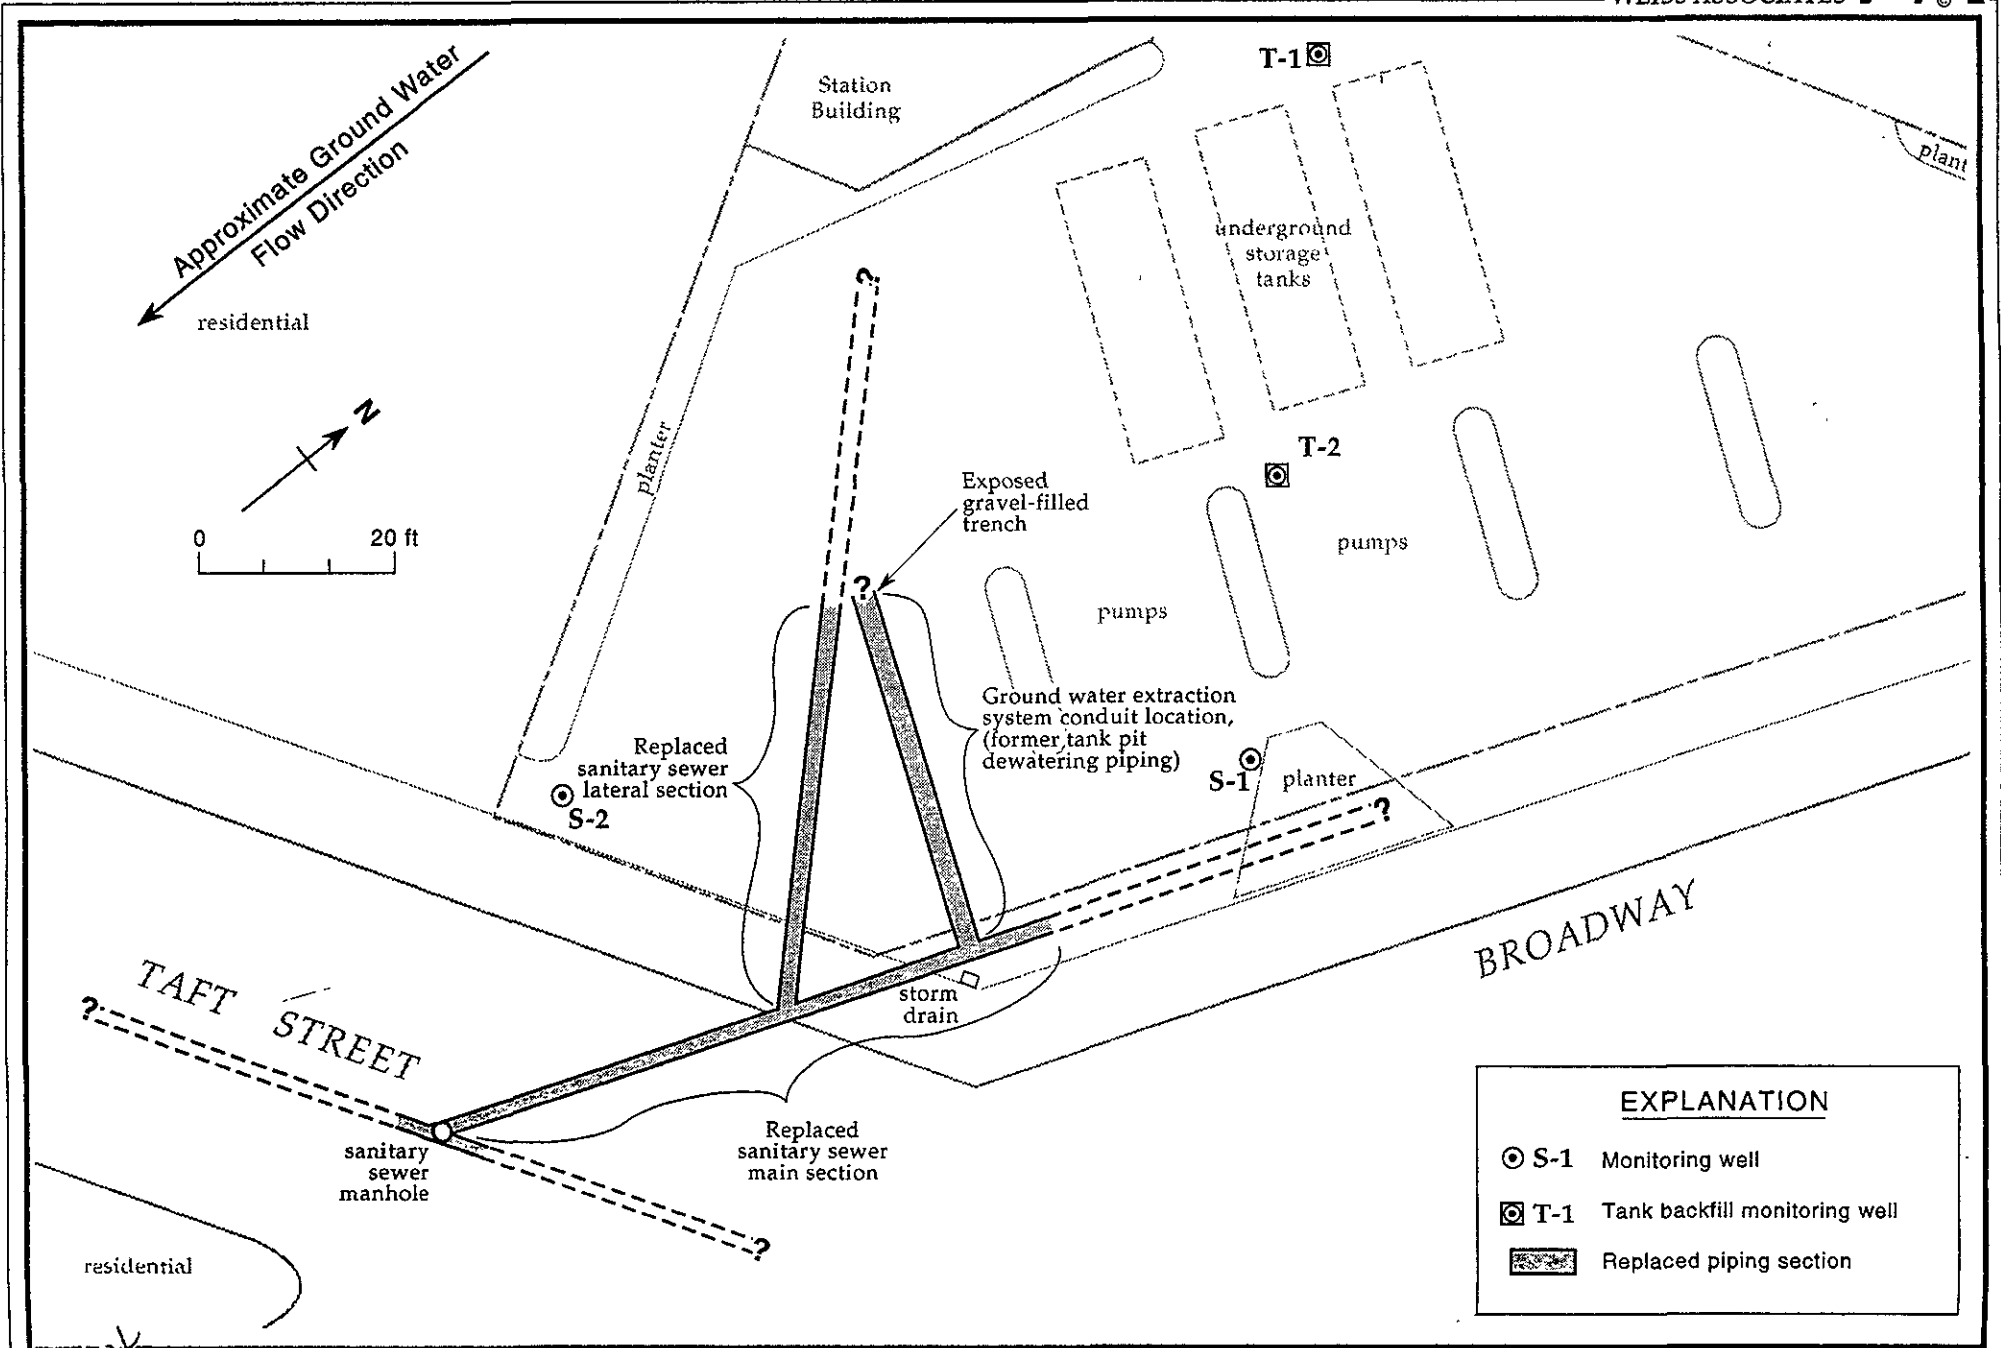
Sanitary Sewer Excavation and Piping Locations - Shell Service Station WIC #204-2004-0204, 5755 Broadway, Oakland, California
